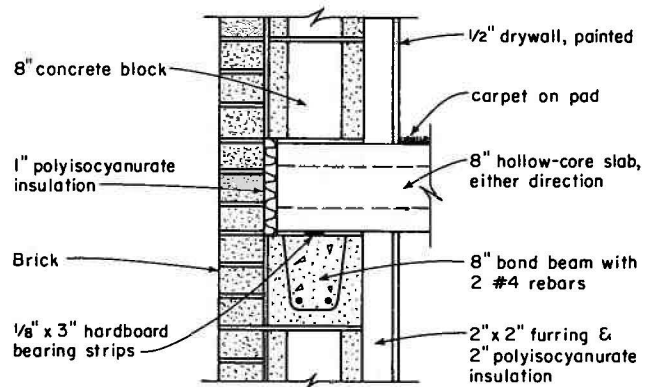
Hollow-core floor slab and composite wall of fire-resistive structure (Building 2).
